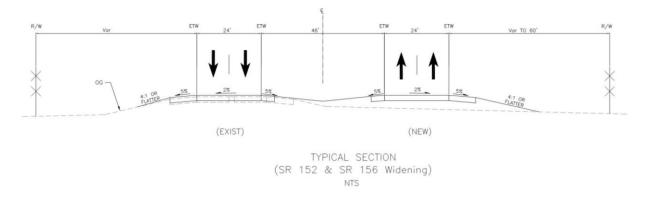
Proposed SR 152/156 Widening Typical Section (East of New Roadway Section)
